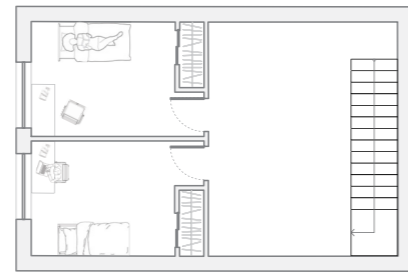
Floor Plan Iteration Four (Scale 1:100)
